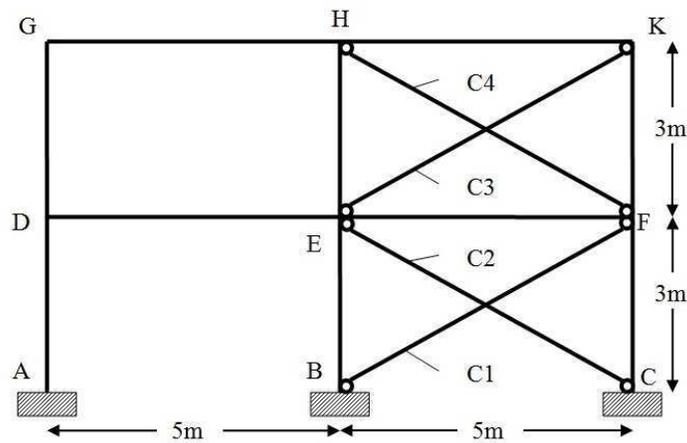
The RC frame F2 with X-braces cable-strengthening
